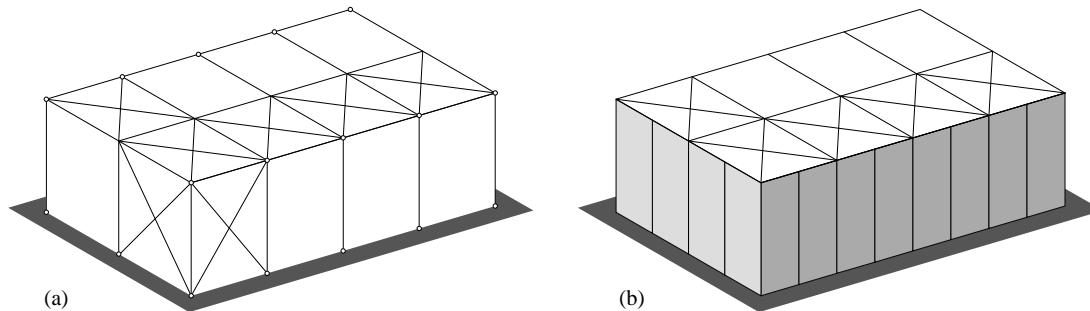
Stabilization system in the pavilion (a) wind bracing (b) glass panel
